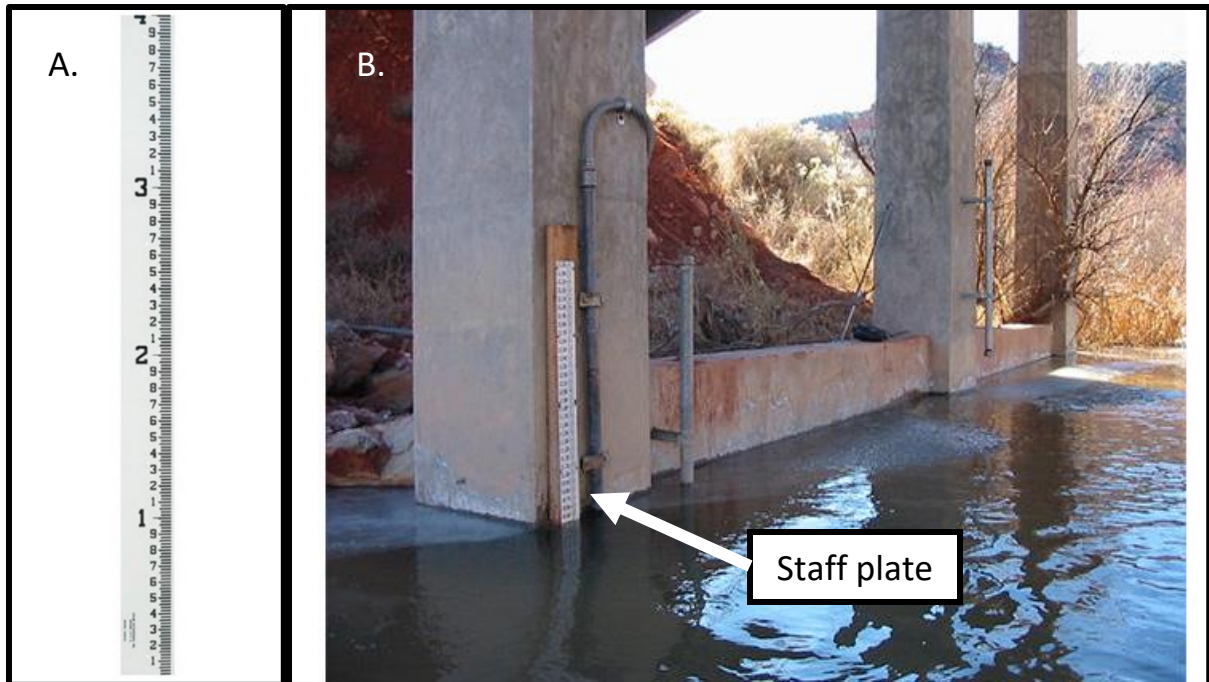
A. Staff plate marked in feet and tenths of feet. B. Staff plate mounted on bridge piling.
